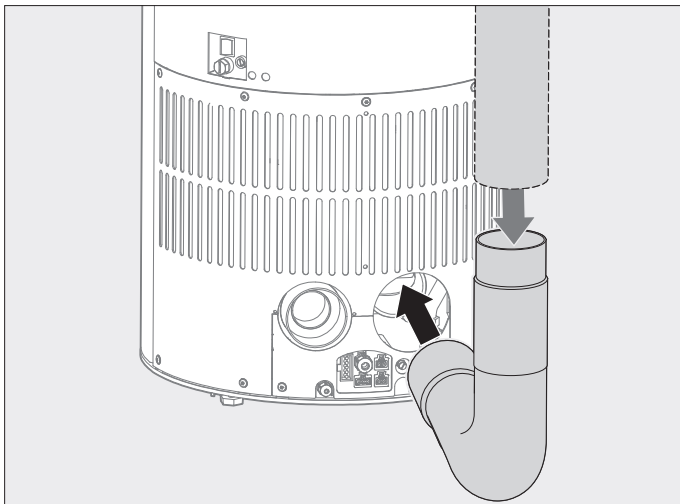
Plug the exhaust pipe (on site) into the connection
